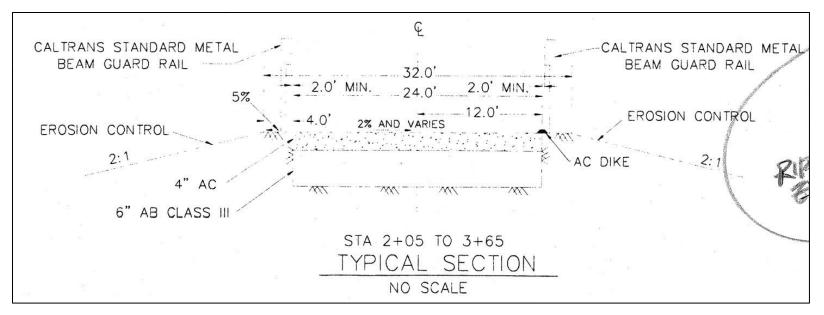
Limekiln Creek Culvert Typical Cross Section
